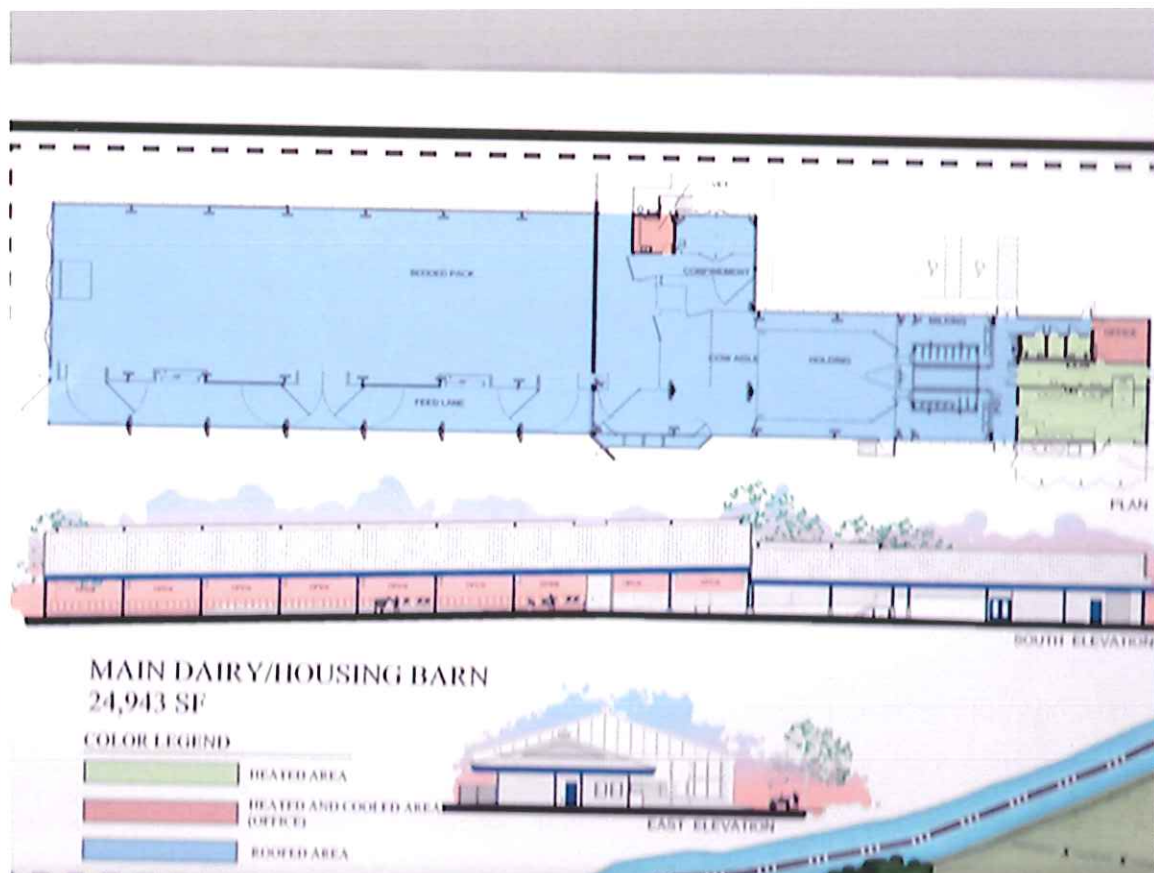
Diagram of the new Dairy floor plan. Collecting water from either parlor roof or loafing roof.
